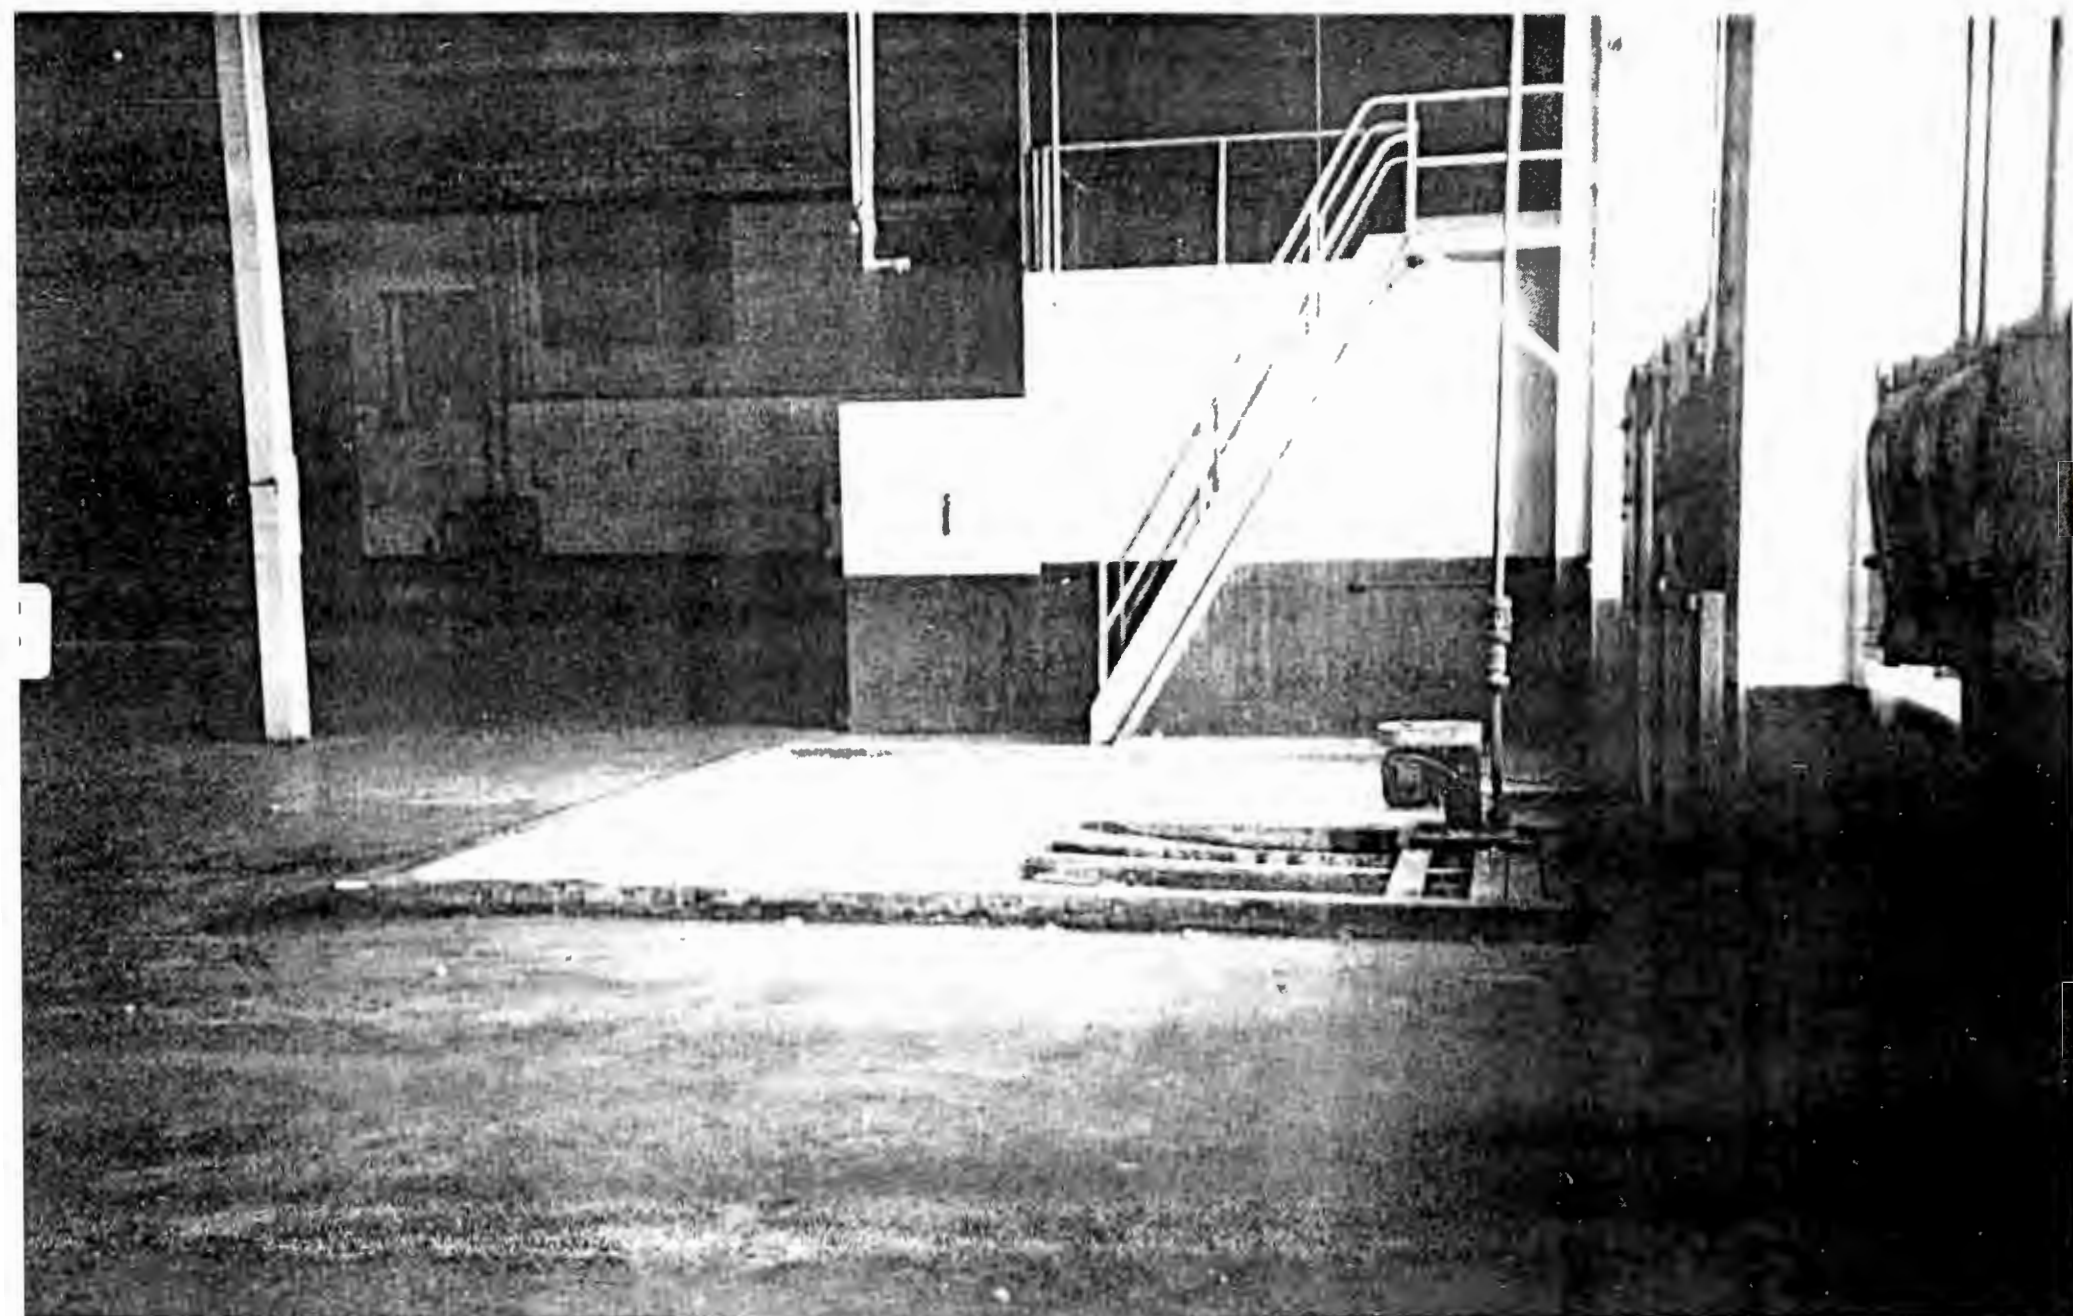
Hydrofluoric Salvage Washing Pit Building No. 13
